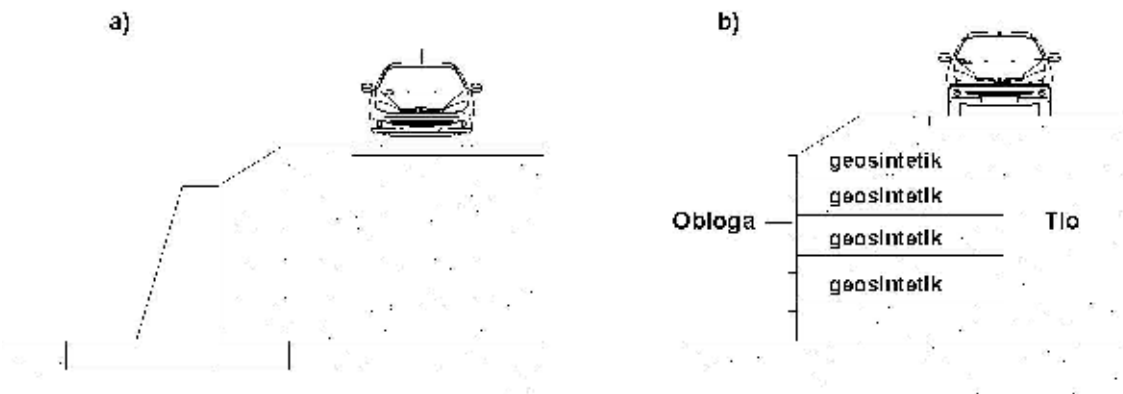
Support structures: a) concrete support wall b) reinforced ground
